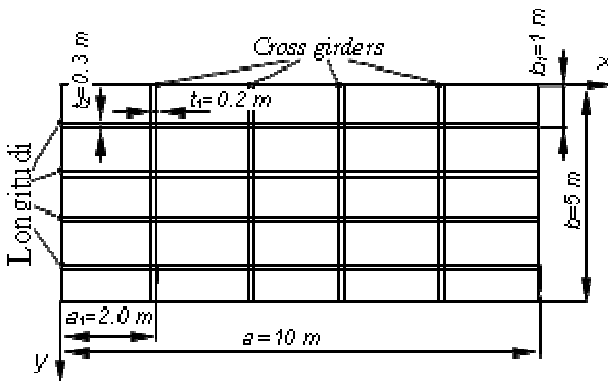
Steel concrete panel reinforced by a 4x4 grid of ribs
